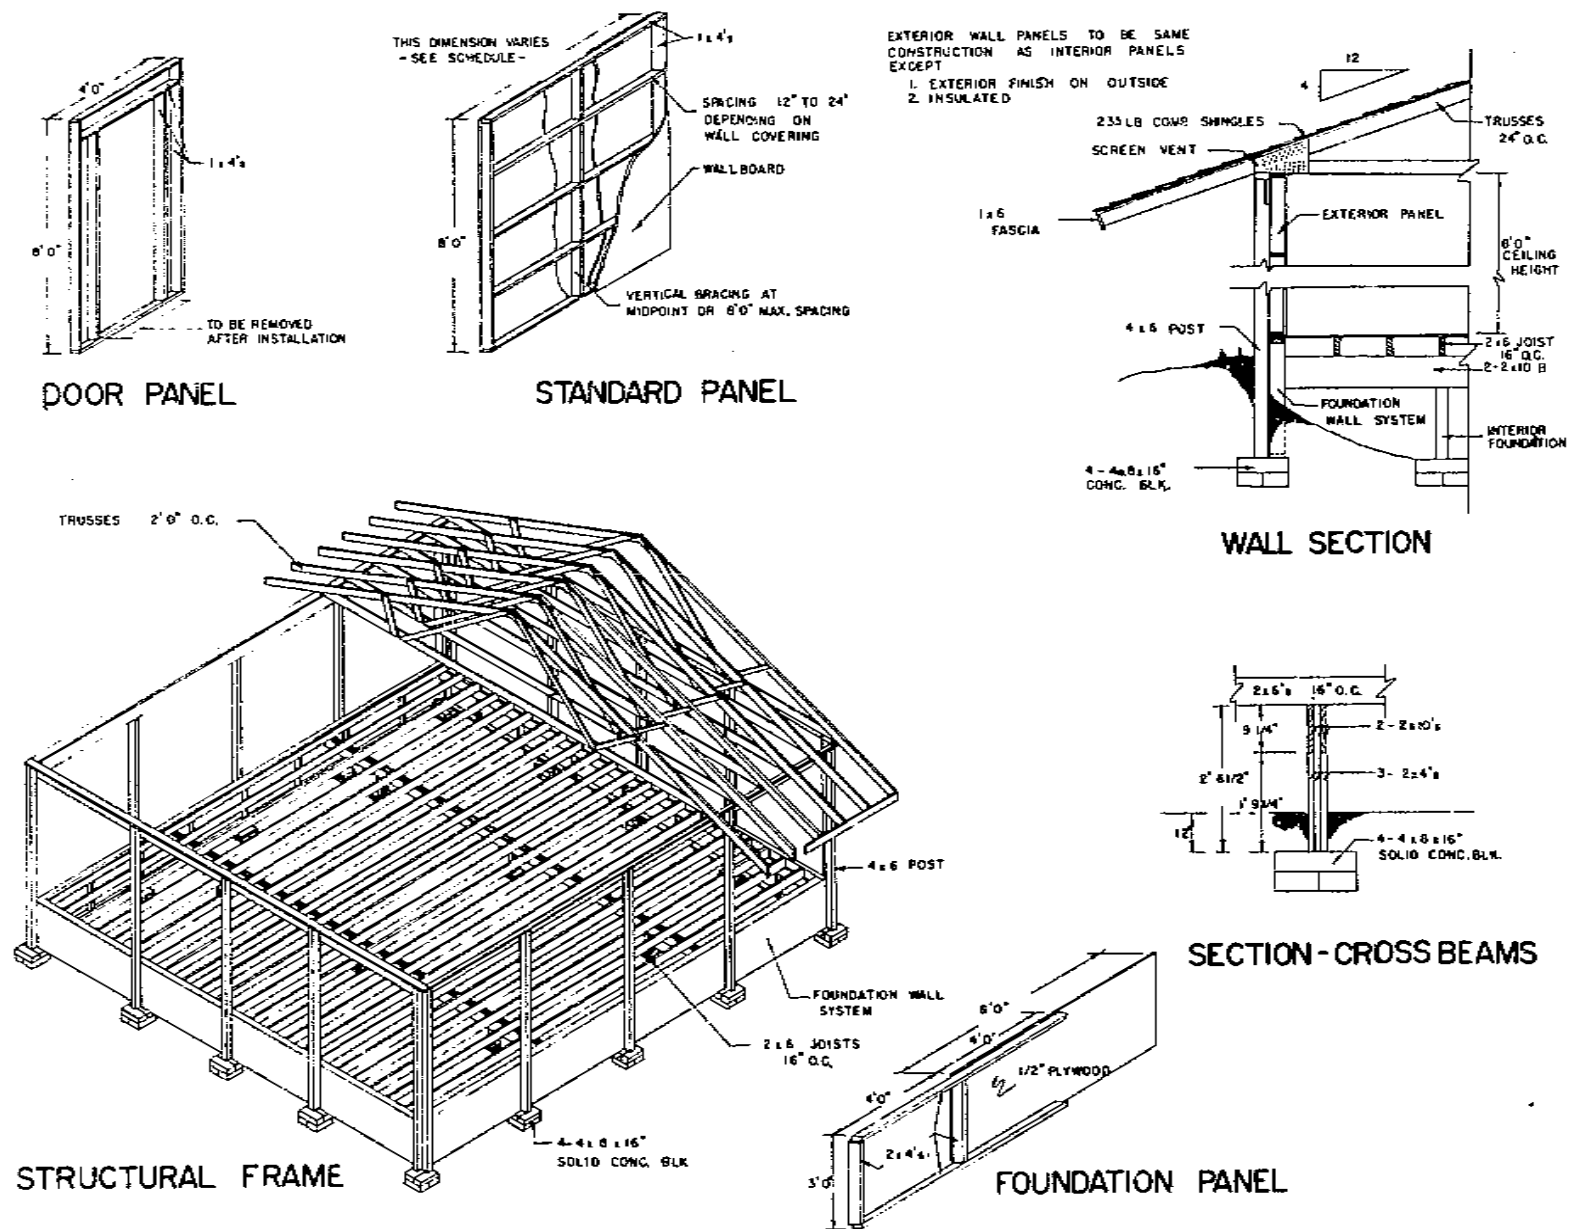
Structural frame, exterior-wall section, cross-beam section, and various panels for first-generation house.
